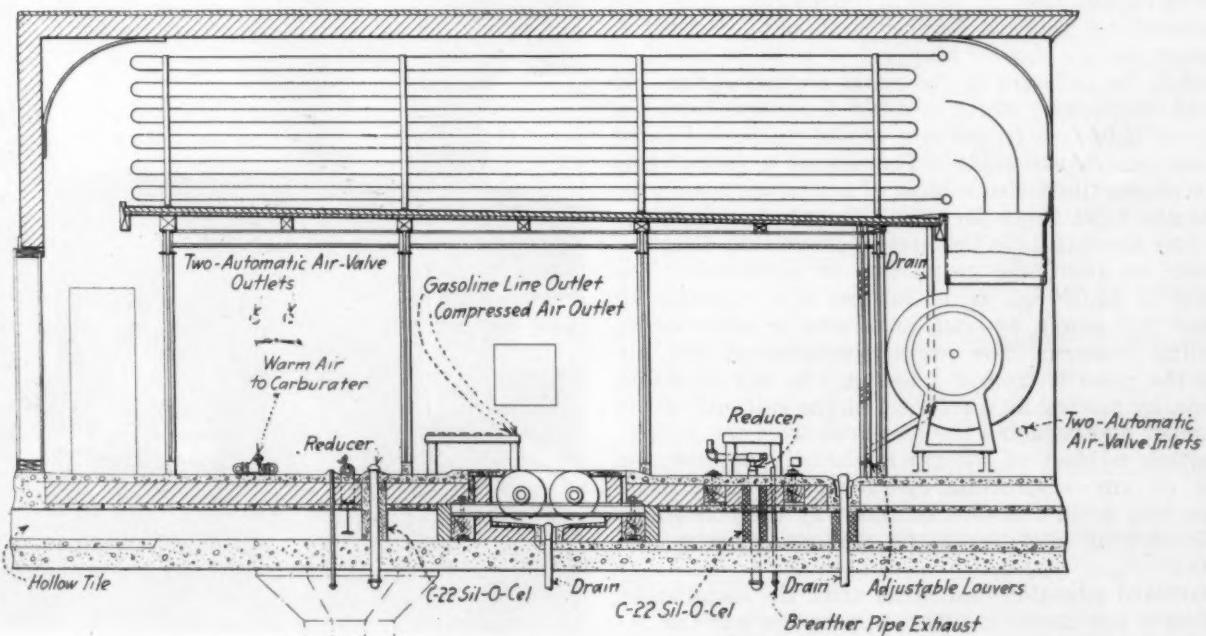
VERTICAL SECTION OF REFRIGERATED LABORATORY
